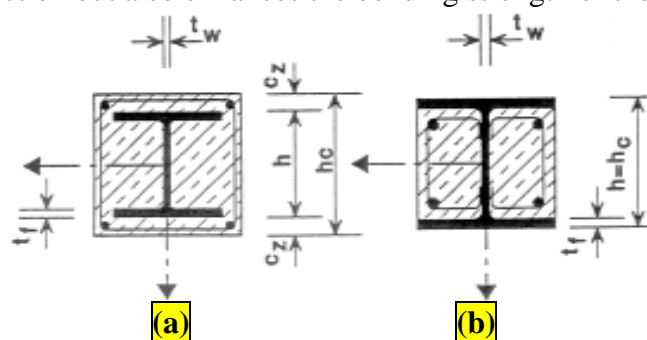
Composite Beam of Concrete Encased Steel Section [3]:
